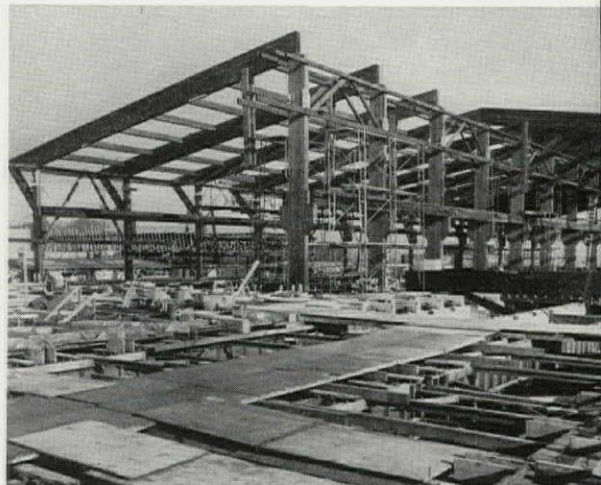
WOOD IS AN EXCELLENT STRUCTURAL MATERIAL FOR USE IN CORROSIVE ATMOSPHERES. THESE GLUED LAMINATED BEAMS, COLUMNS AND CRANE BEAMS ARE BEING ERECTED FOR A CHLORINE PLANT.
